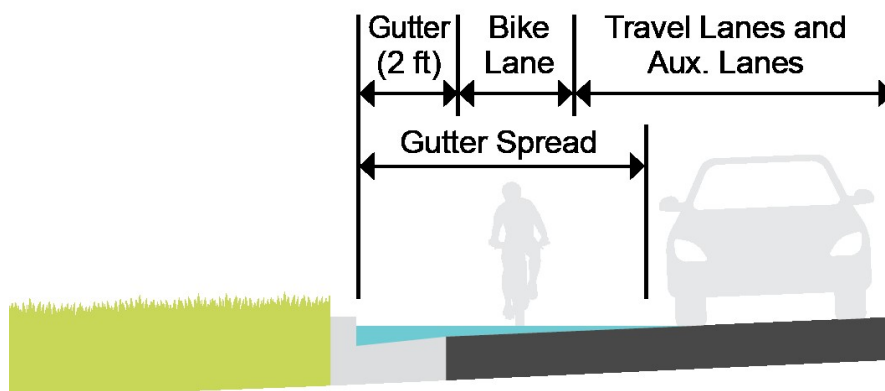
Gutter spread in a typical non-state route urban section for a design storm event
